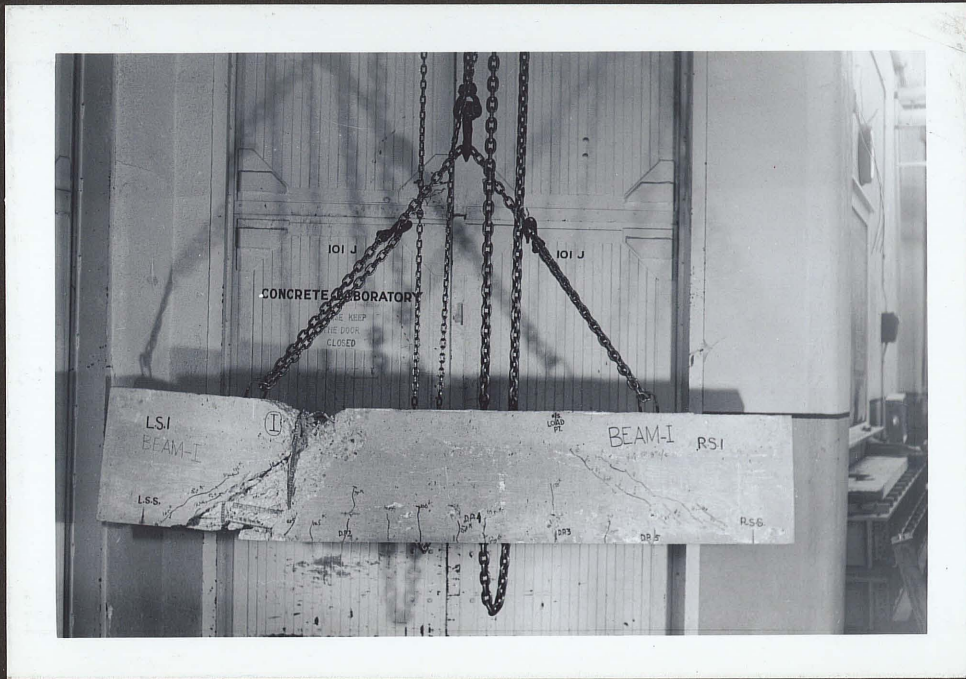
Beam 1 after Failure (side L.S.1-R.S.1)
